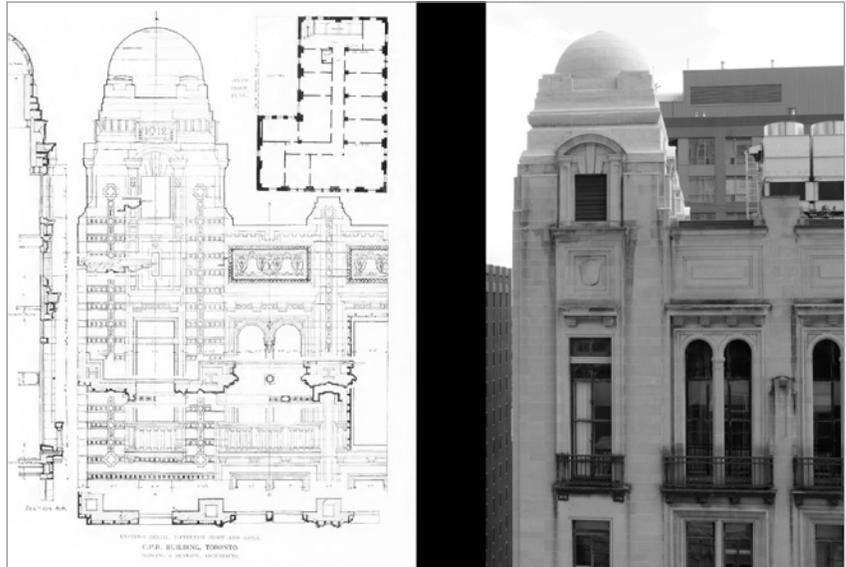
LEFT, TERRACOTTA FAÇADE DETAILS. | CONSTRUCTION, 1913, VOL. 6, NO. 8, P. 296. RIGHT, FAÇADE DETAILS IN INDIANA LIMESTONE (POST 1929). | DAVID E. WINTERTON, 2015.
